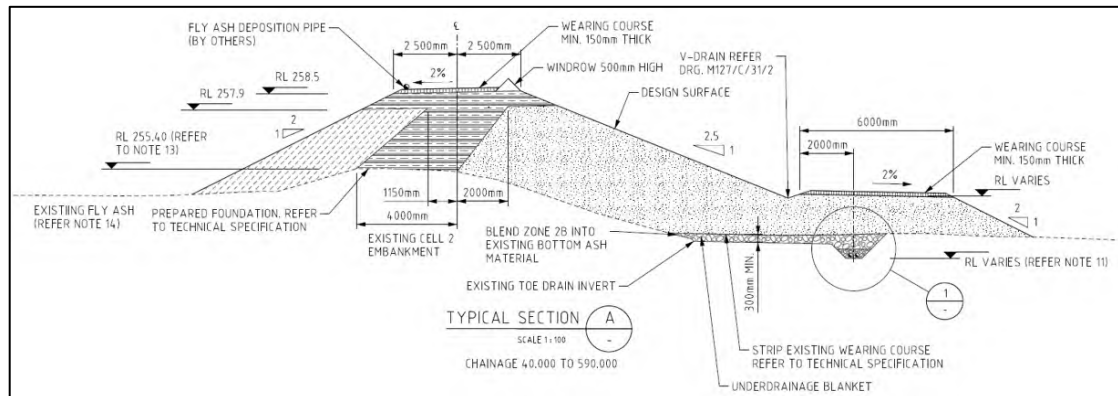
Cell 2 downstream underdrainage pipe (DM ID: [26686306](#))
